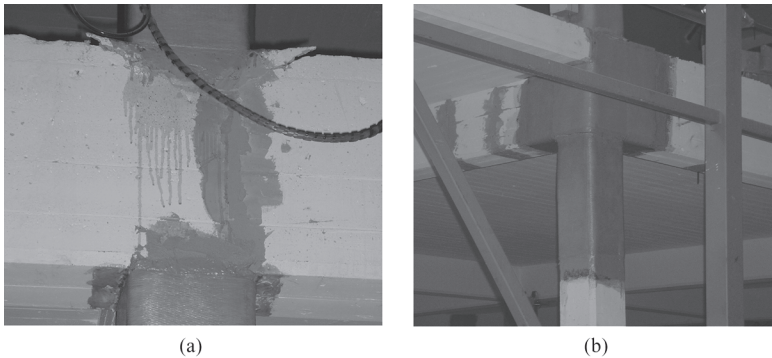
Damage at unstrengthened joint of column C9 (a) and at corner joint of column C2 (b)
